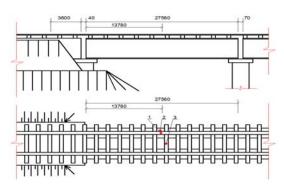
Scheme of a metal span structure with the arrangement of vibration sensors on structural elements: 1 - middle of the beam span structure; 2- the sole of the rail; 3- middle of the wooden beam.
